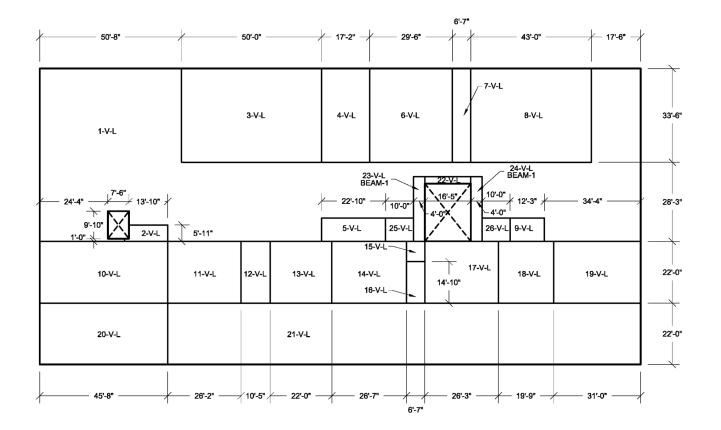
H.3-11 North Wall Looking South Vertical Reinforcement Zones Far Side Face
